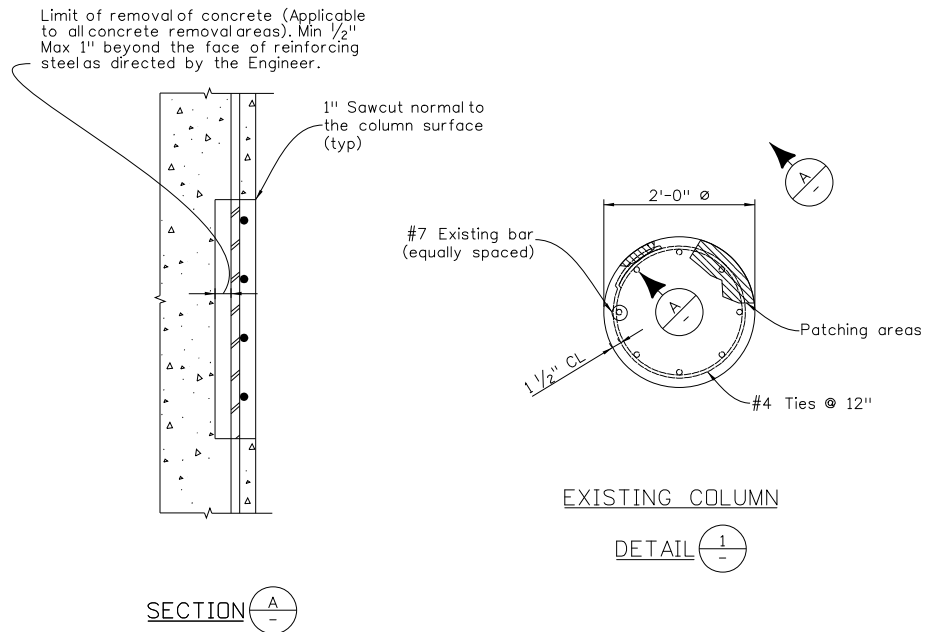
(D)-1 Sample General Layout for a Pier Cap/Column Repair
